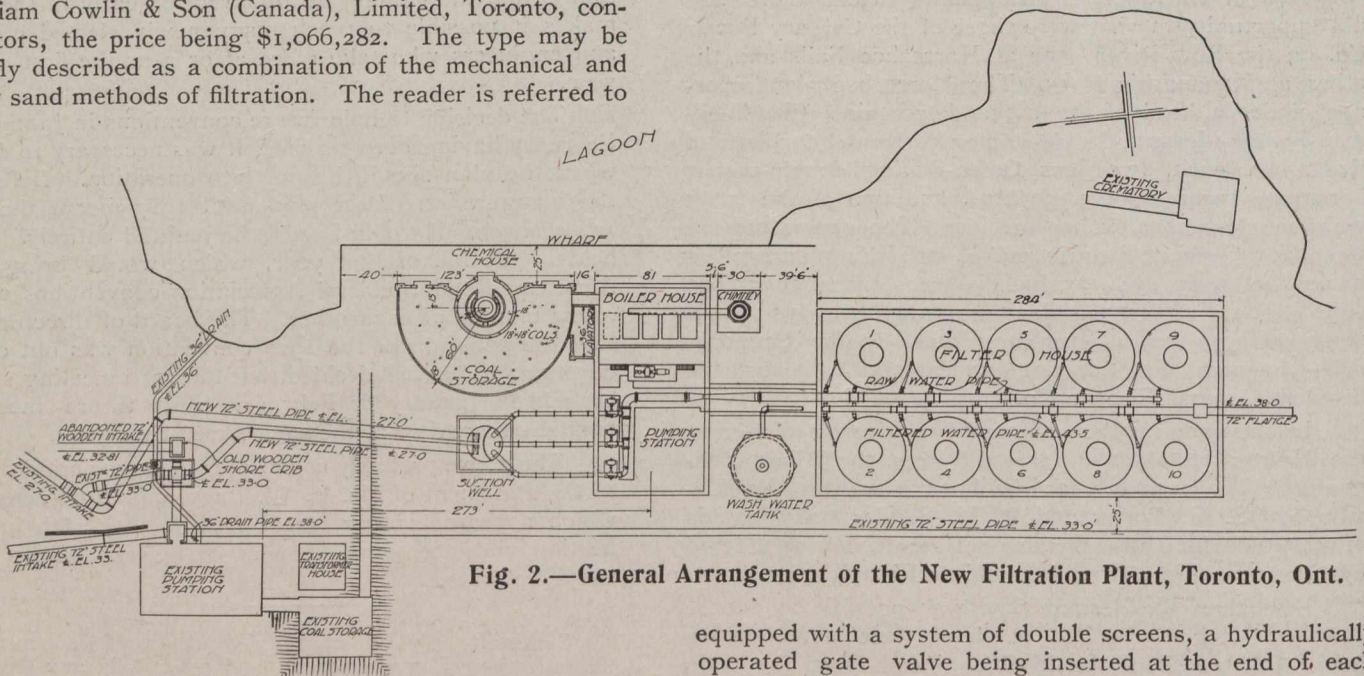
General Arrangement of the New Filtration Plant, Toronto, Ont.
